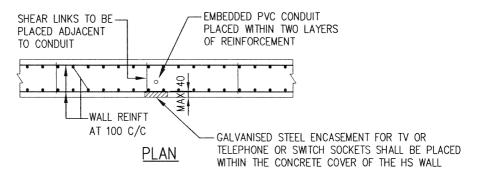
(f) TYPICAL DETAILS OF EMBEDDED CONDUIT IN HS WALL
